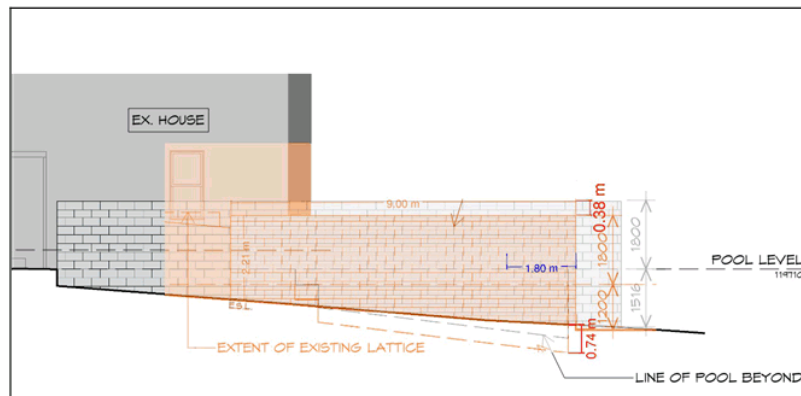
Overlay of Amended plans on Advertised plans (Prime Design, 2022)
